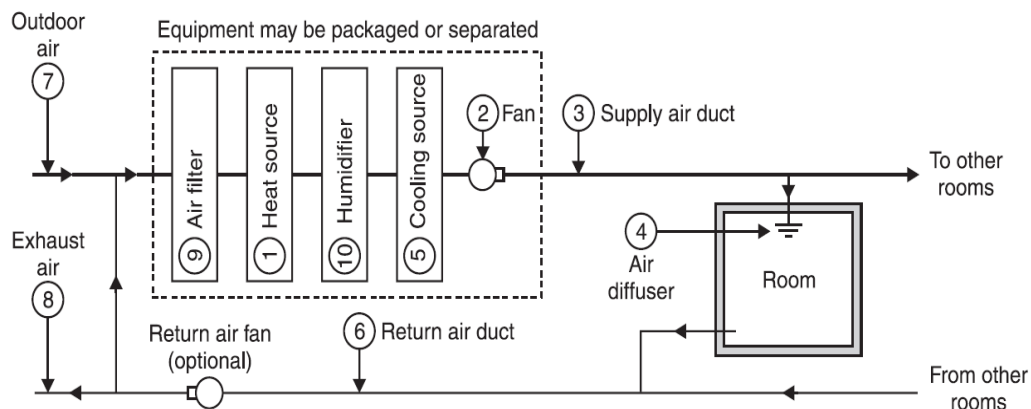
Arrangement of basic components of an all-air heating and cooling system
